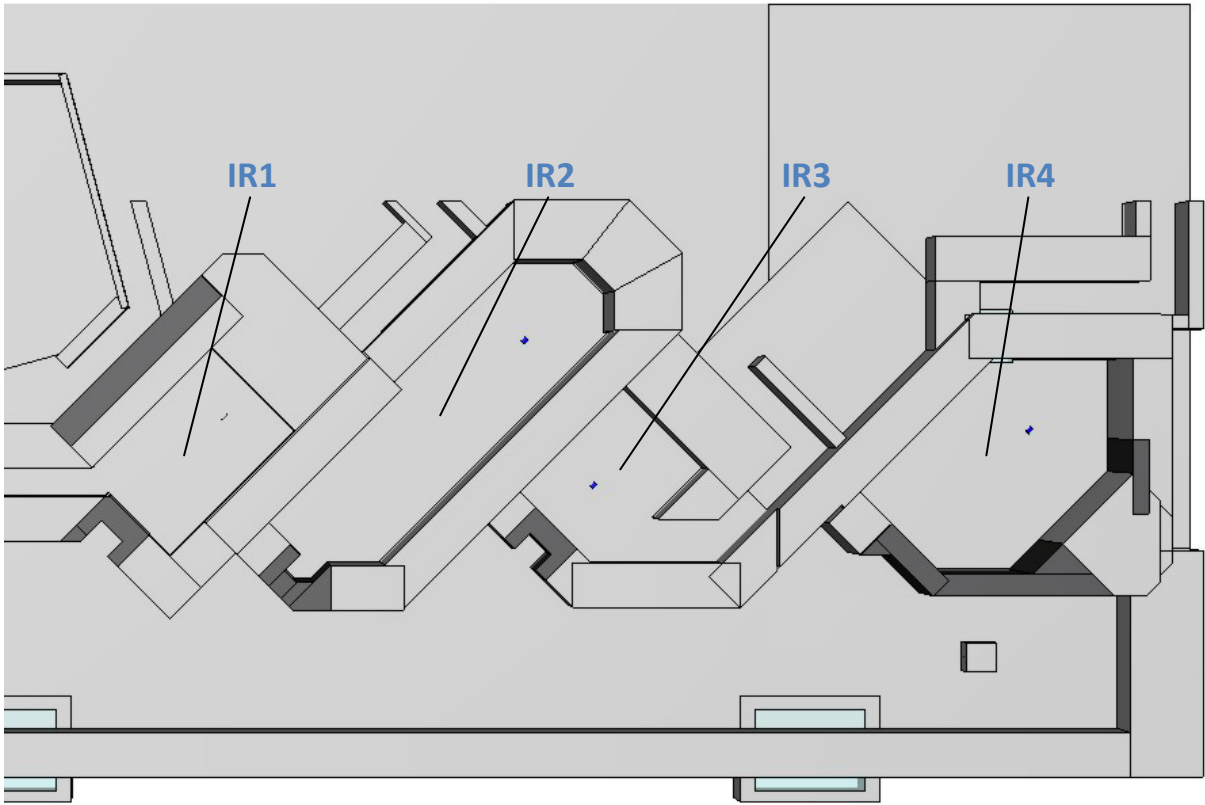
Top view of the 4 irradiation rooms with targets inside. Grey areas are made of concrete, dark grey means heavy concrete which has double density of normal concrete. The ceiling was made transparent for a better view.
